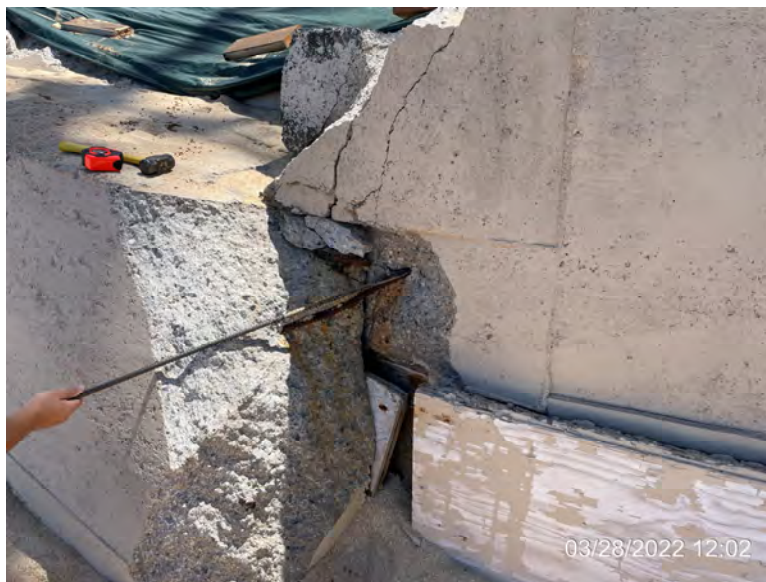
South side of property seawall facing mauka (showing broken concrete pieces, zoomed)
